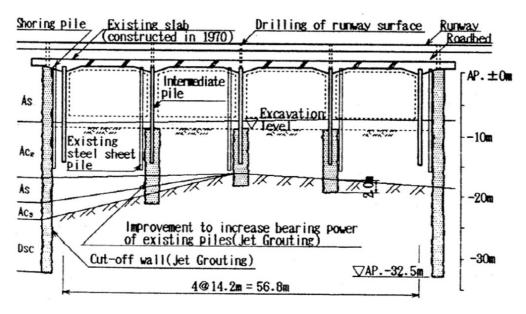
Excavation support seepage control by jet Grouting beneath existing airport runway
